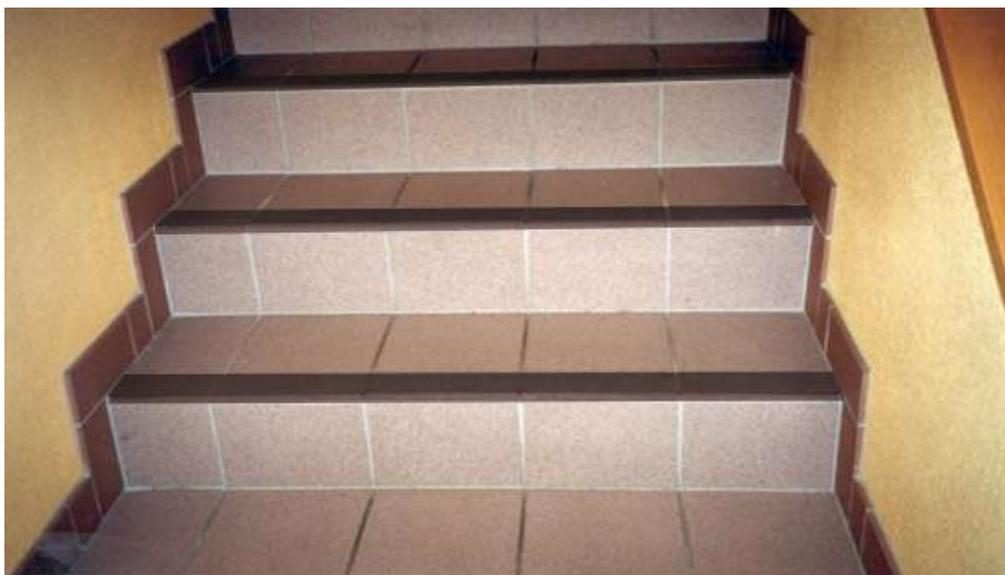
Wall base contrasts with wall and stair treads are distinct. Source: photograph taken by the authors.
